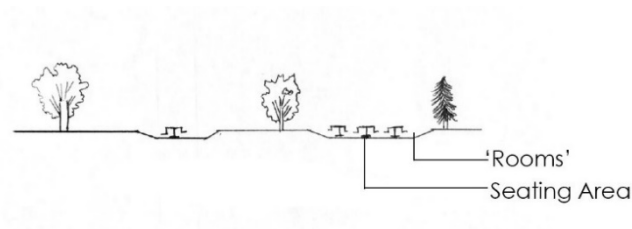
Hand sketch of 'sunken rooms' along Whistle Stop Walk
